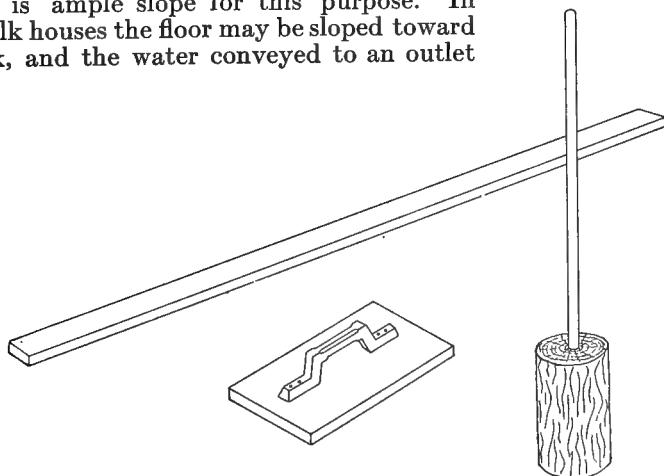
Straightedge, Wooden Finishing Trowel and Wooden Tamper.
